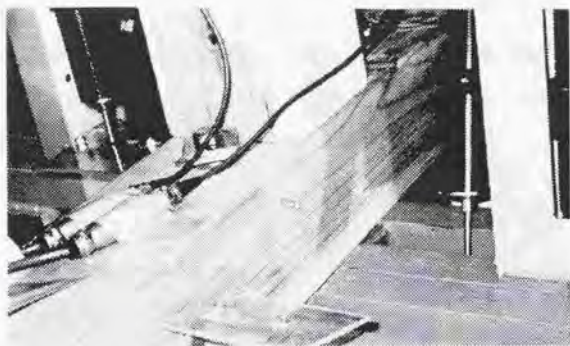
1. The fatigue failure of bracing joint with a nail in specimen SGN.
